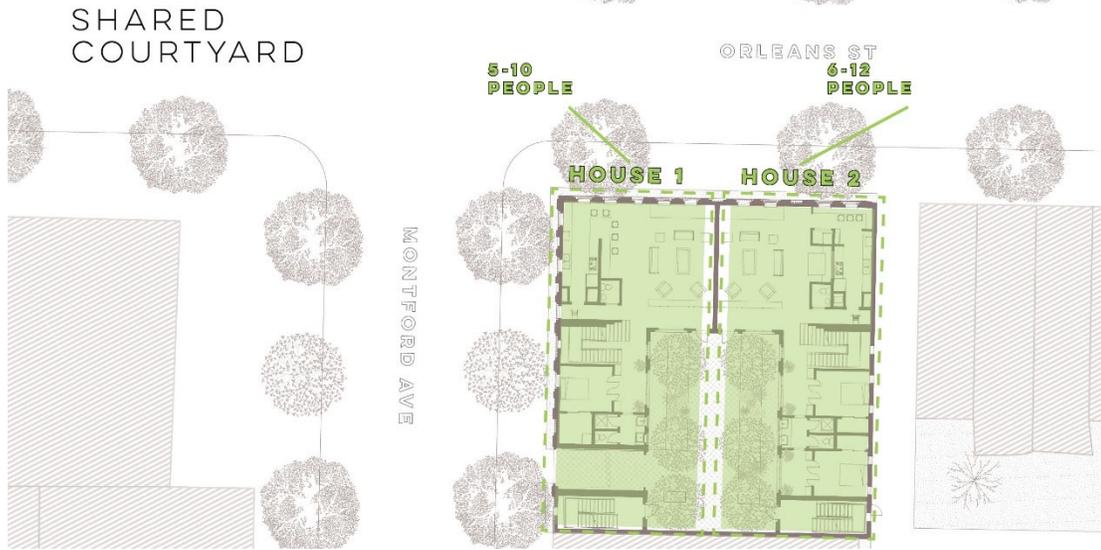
The house layout of the shared courtyard lot and their respective occupancies, (Source: Author)
